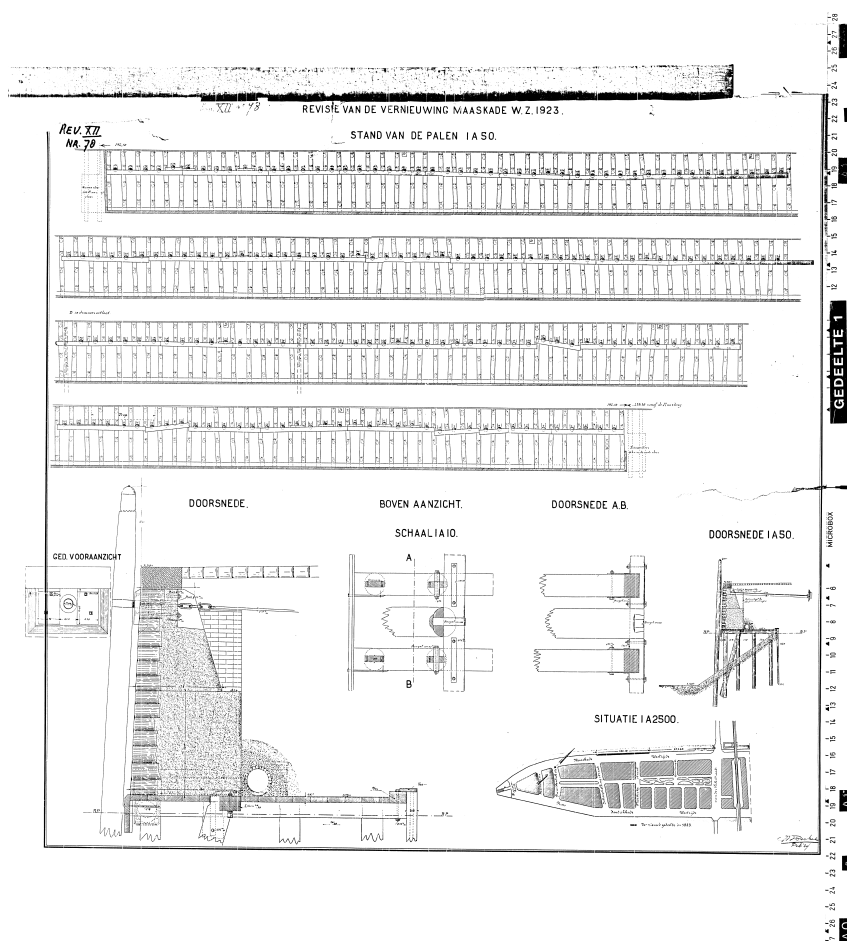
Section 4-1, detailed drawing of the pile plan as built (top), cross section and detailing (bottom), placement along the quay (bottom right). Note the presence of a drainage pipe behind the retaining wall (bottom left) [63].
